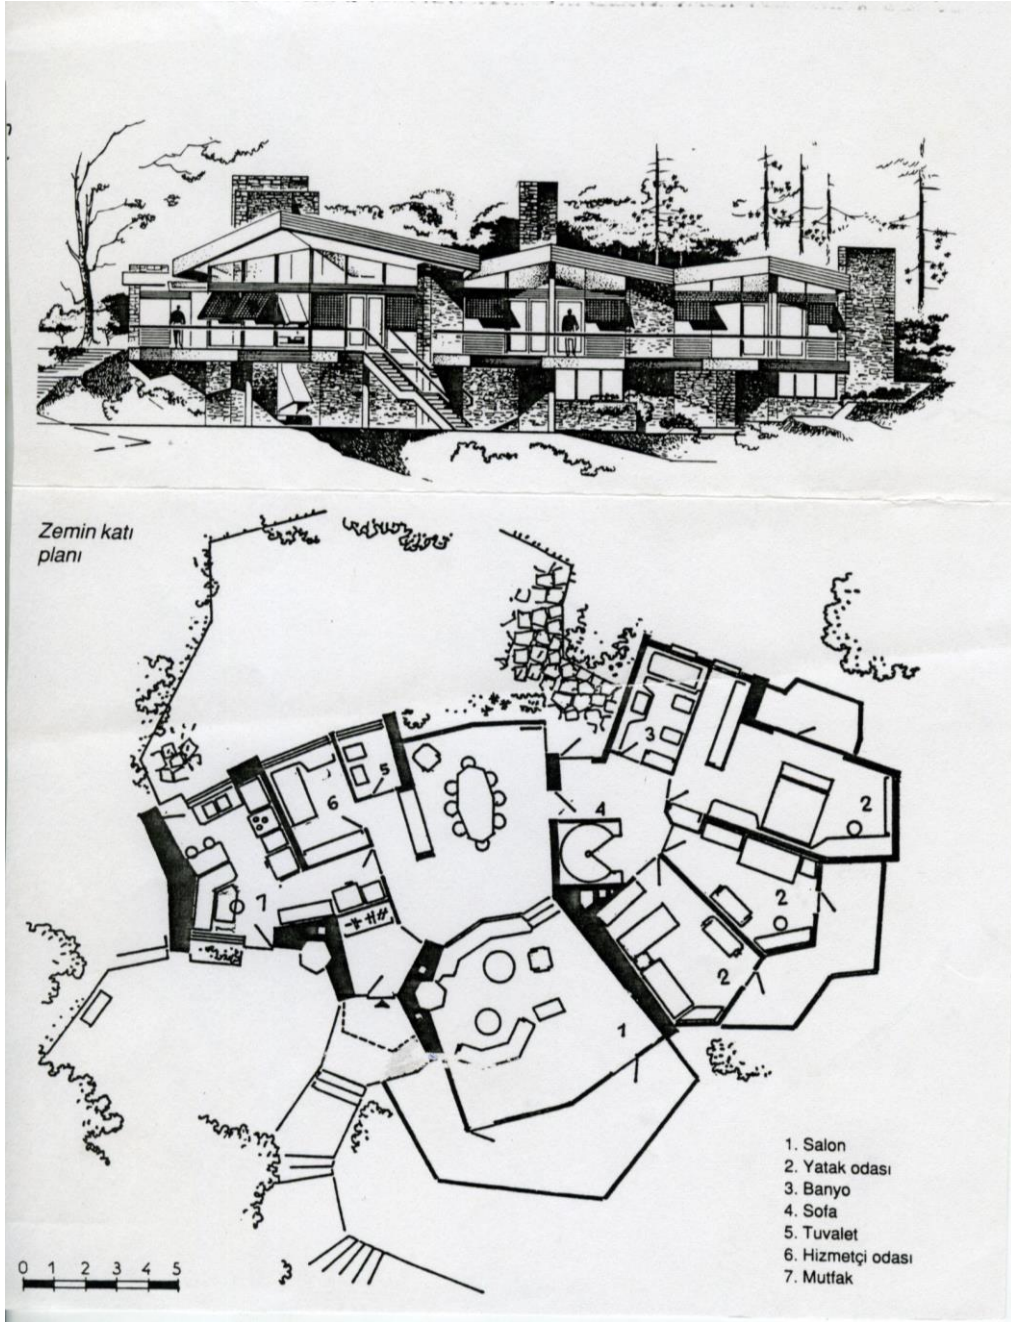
Architectural drawing and floor plan of Zübeyr Şeyhun Villa, 1965
